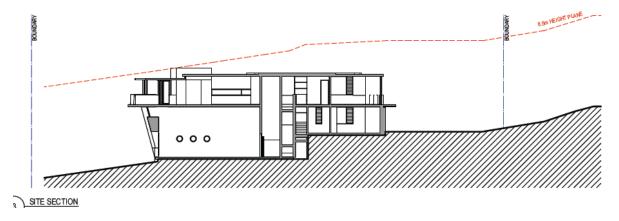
Section of 8.5m building height plane over site (fully complies)
